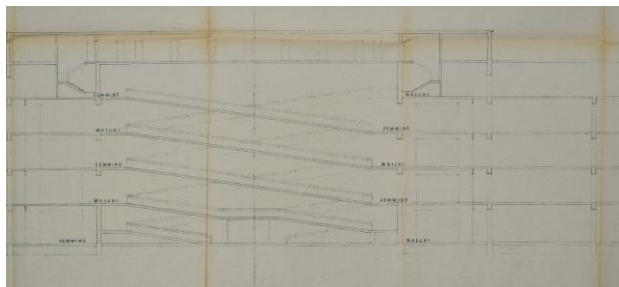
Project drawings of the ramps (Ravenna State Archives).
